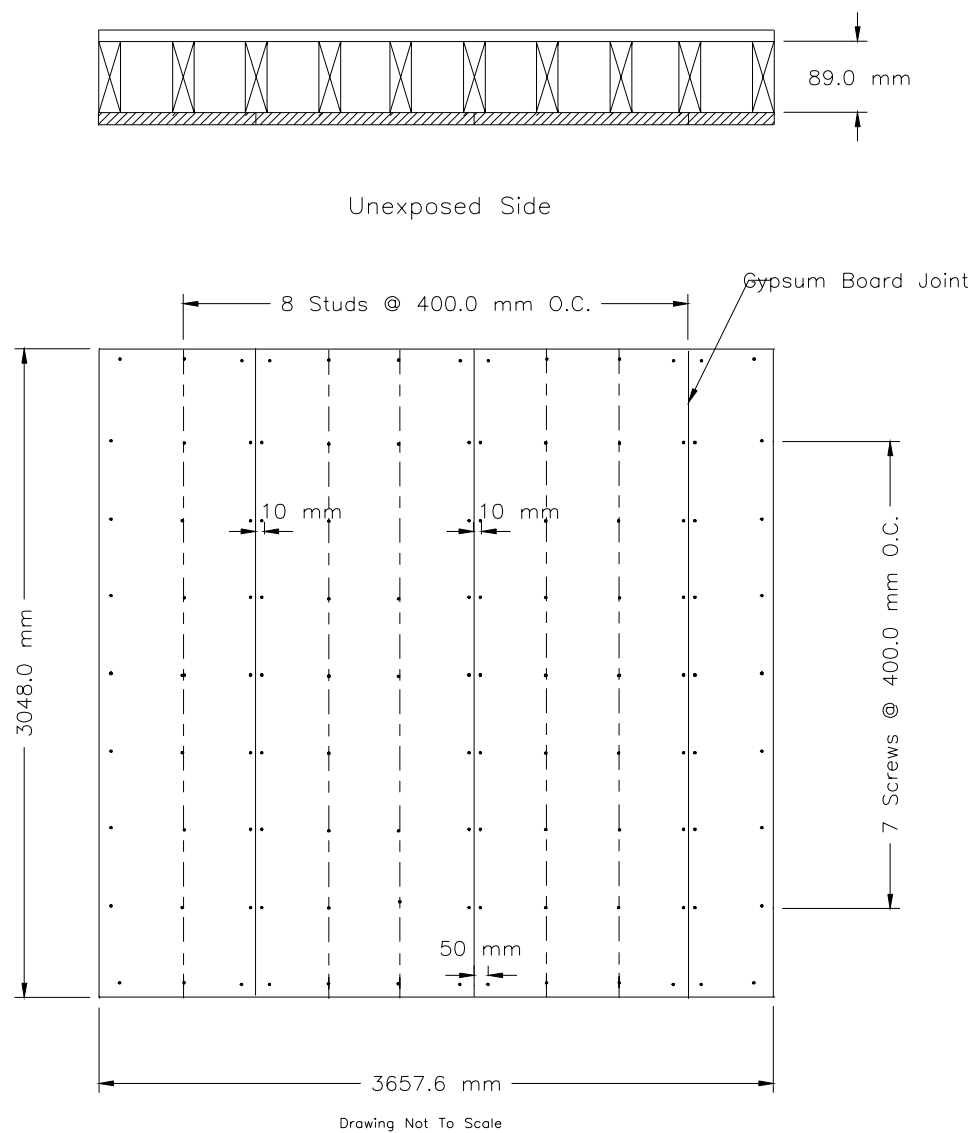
Screw Locations For Wood Stud, 1x1 Gypsum Board Layers, Full-Scale Assembly (Unexposed Side)
